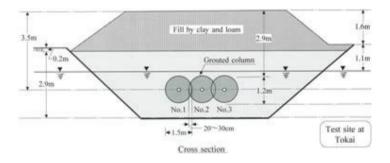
Cross section of the horizontally jet-grouted columns in Tokai, Japan.
